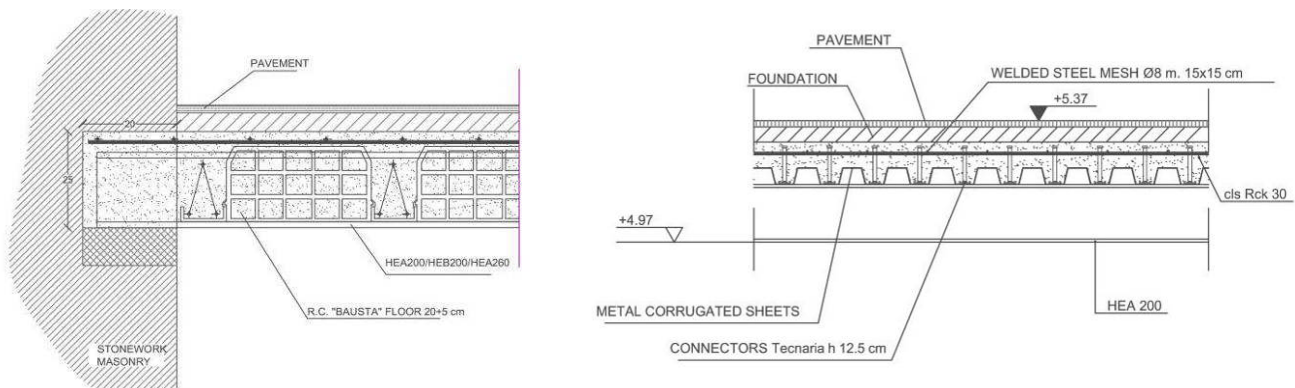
Composite steel-concrete structure: original design (left) ad solution applied (right).
